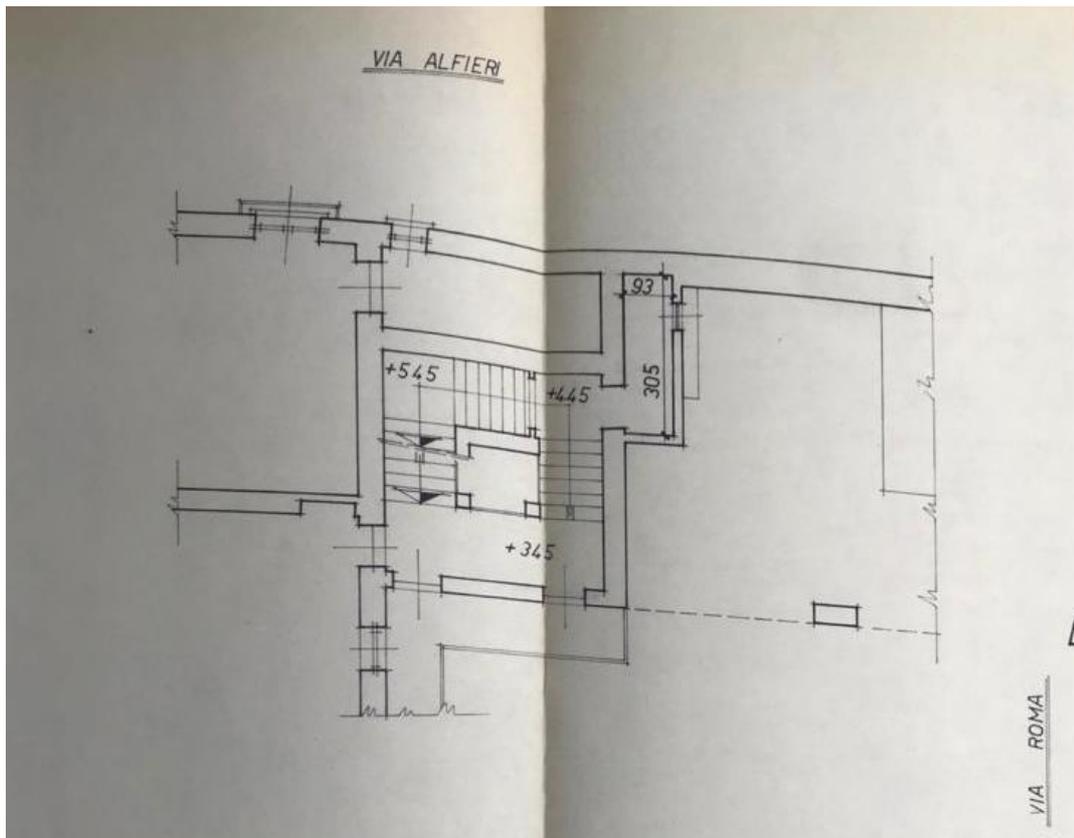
Mezzanine Floor Plan (Via Alfieri 2)
